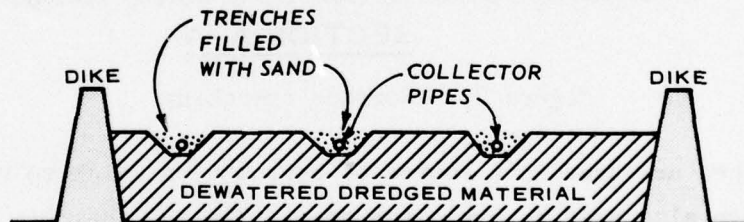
Trenches used for underdrainage of subsequent lift of dredged material. Dredged material must be strong enough to support hauling equipment
